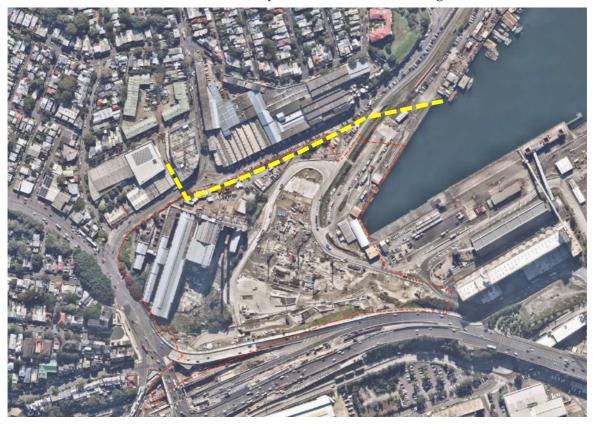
Aerial View showing the location of the Beattie Street Stormwater Channel no. 15. (*Source: Cox with Design 5 markups*).
